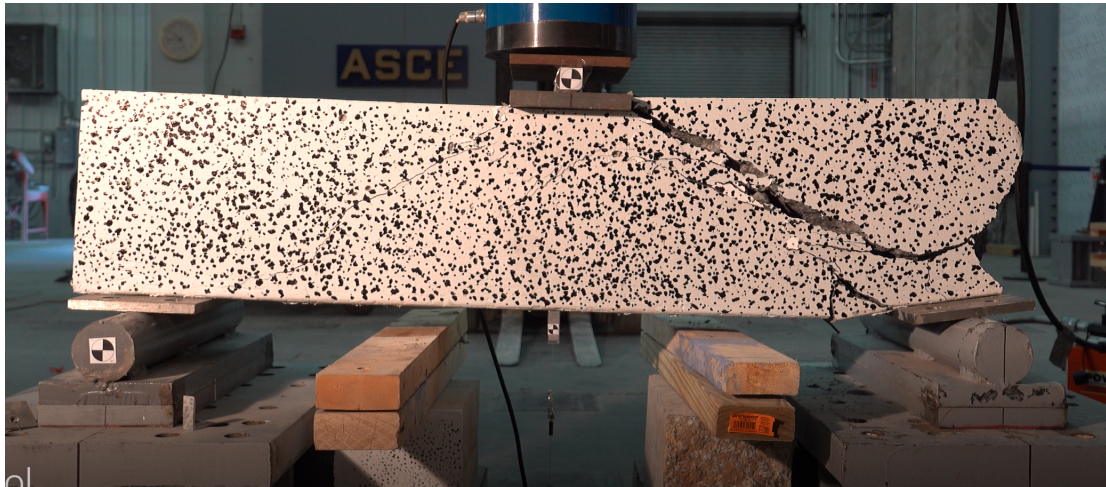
Behavior of “as-built” reinforced concrete beam at failure.
